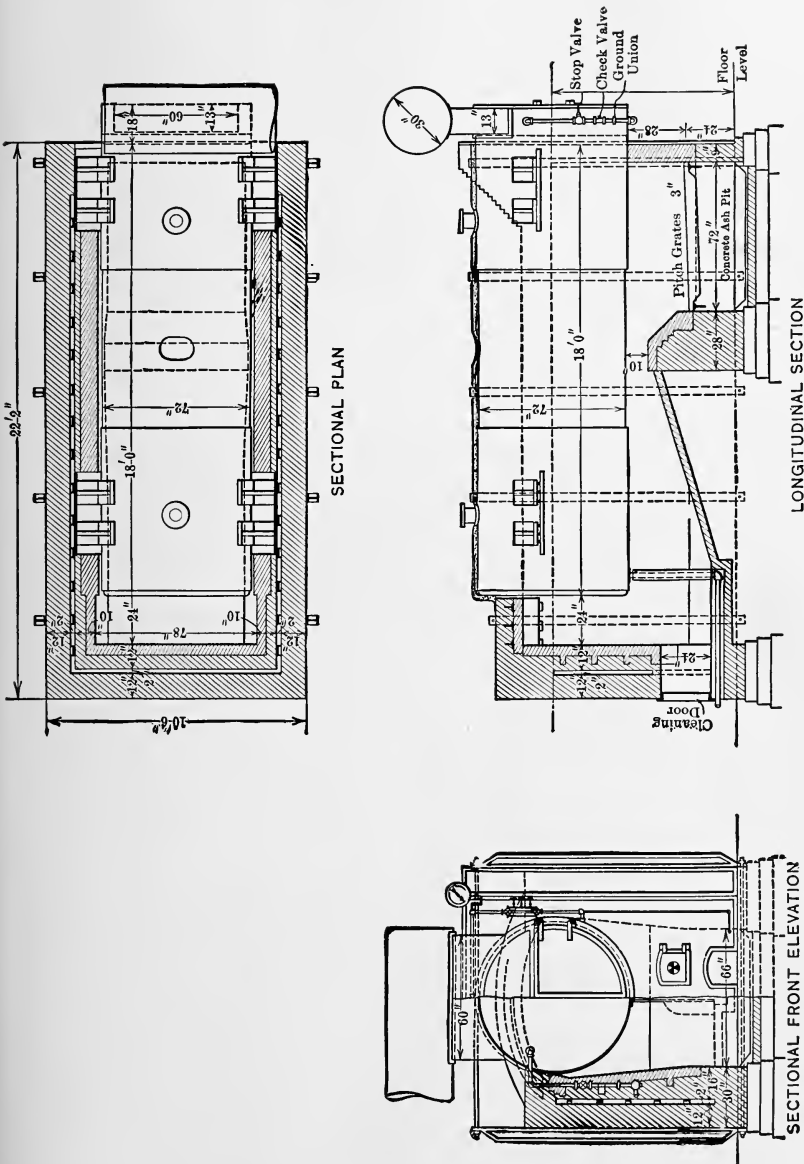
Return Tubular Boiler and Standard Double-wall Setting — Extended Front.
